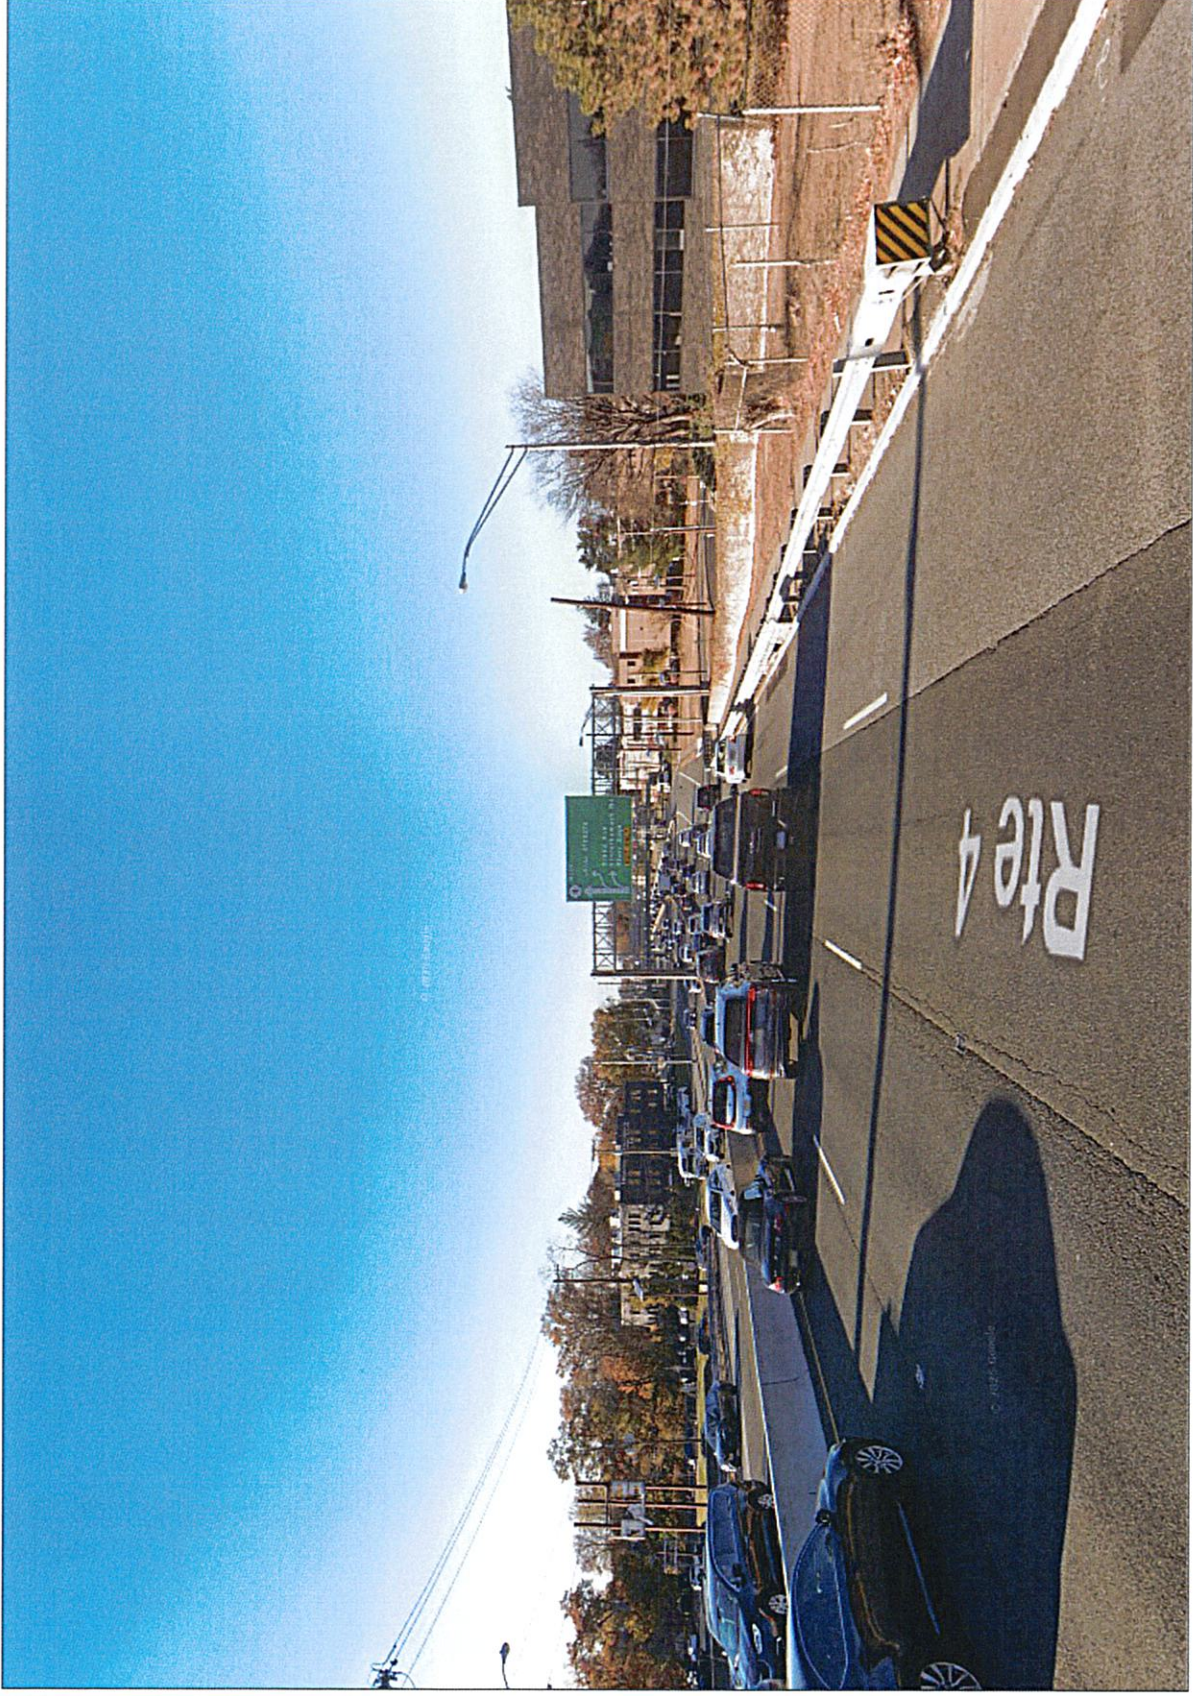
NJSH 4 WB. APPROXIMATELY 600 FEET EAST OF PROPOSED SIGN
